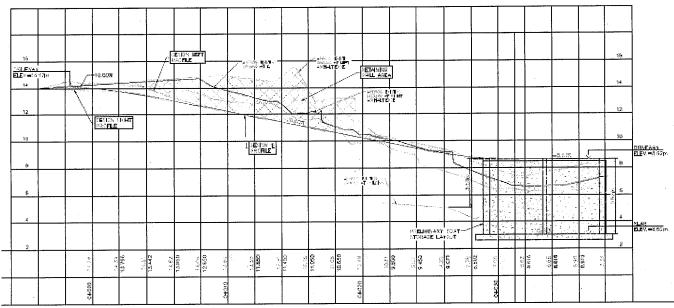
Profile of proposed driveway access and engineered accessory structure at 341 Chemainus Road.
